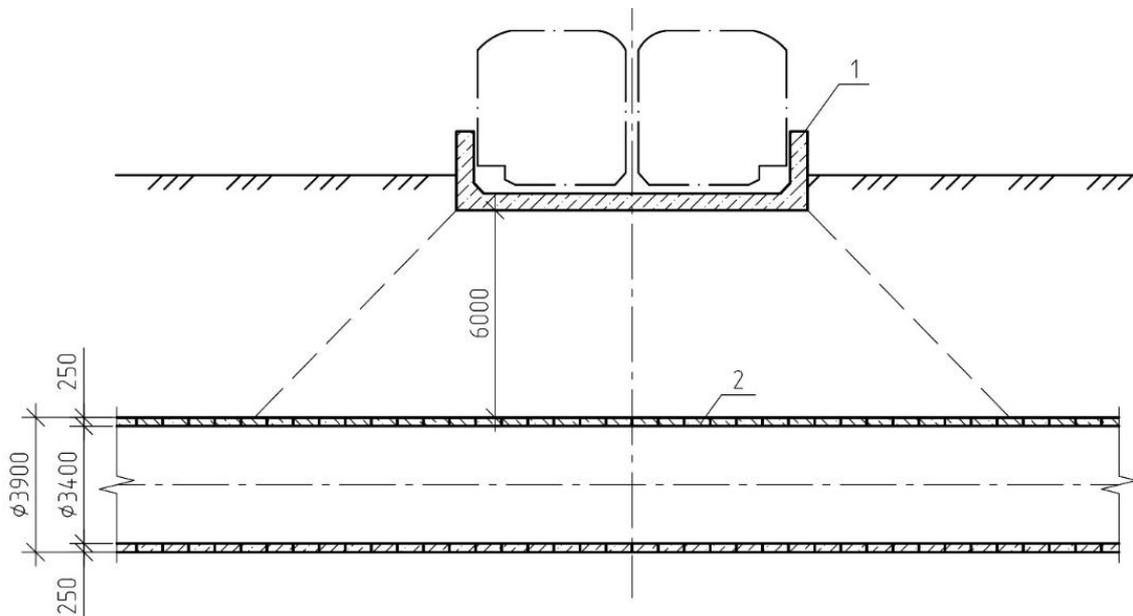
Longitudinal section along the axis of the collector tunnel under construction (2) with a cross section of the operating metro section (1).
